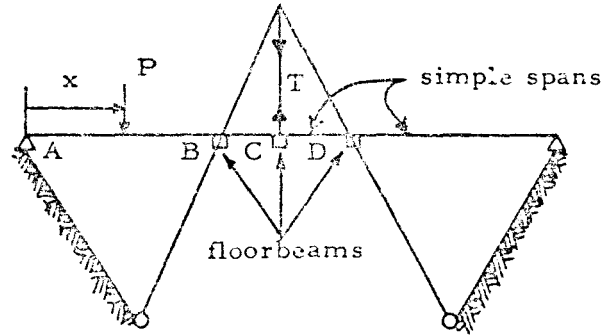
"A" FRAME BRIDGE, ELEVATION VIEW
